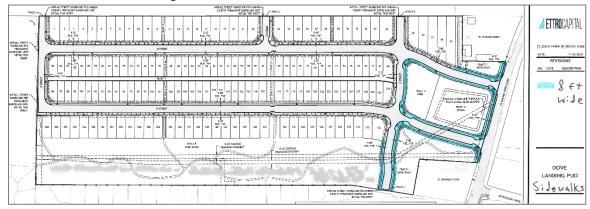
Sidewalks (blue: min 8 ft wide)
